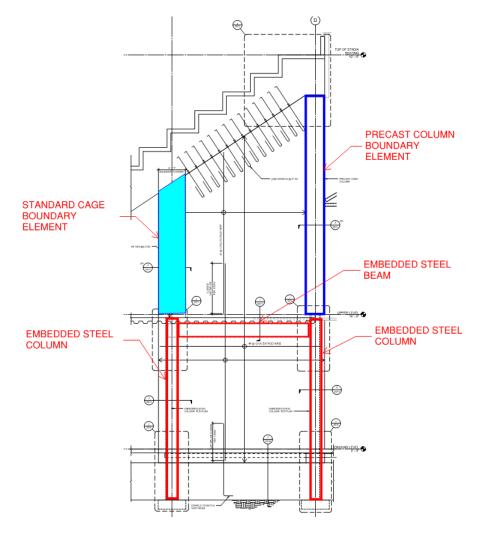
IWTG Typical Concrete Shear Wall Elevation
